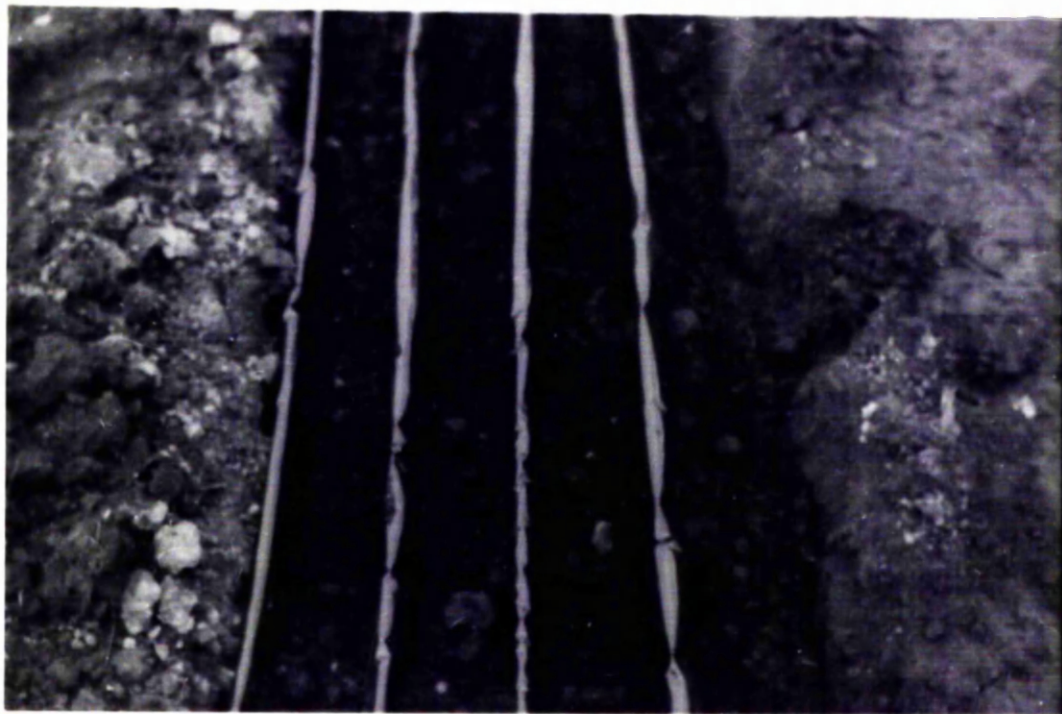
Back filling with both sub-soil layers complete on three sections.
